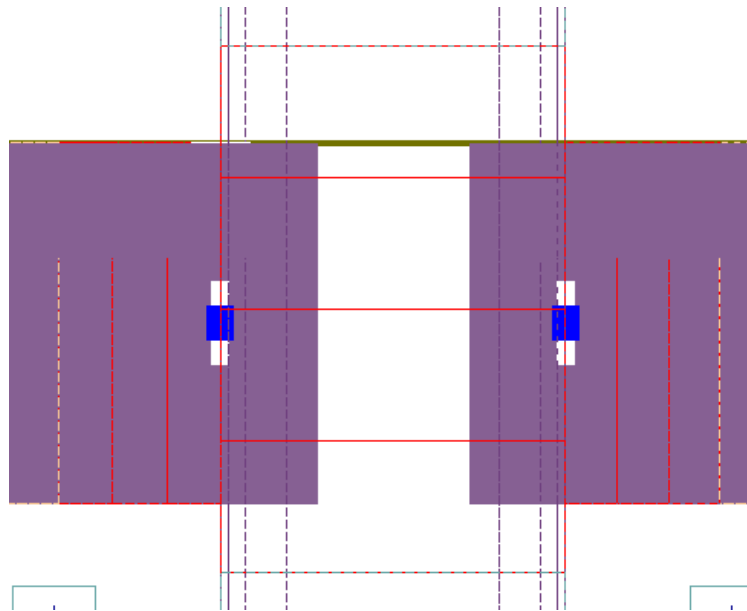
Extent of beam rigid end zone, shown in red, approximately 7.0 in. from the face of the column on either side.
